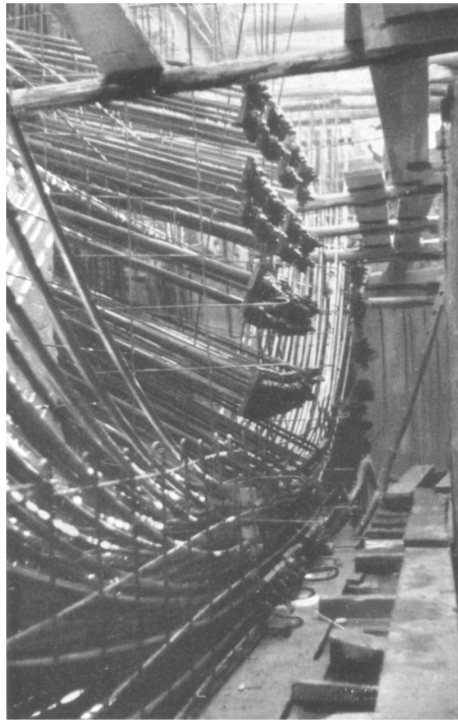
View into supporting cross girder with prestressing bars of the *Nibelungenbrücke* in Worms (Wahl 1953)
